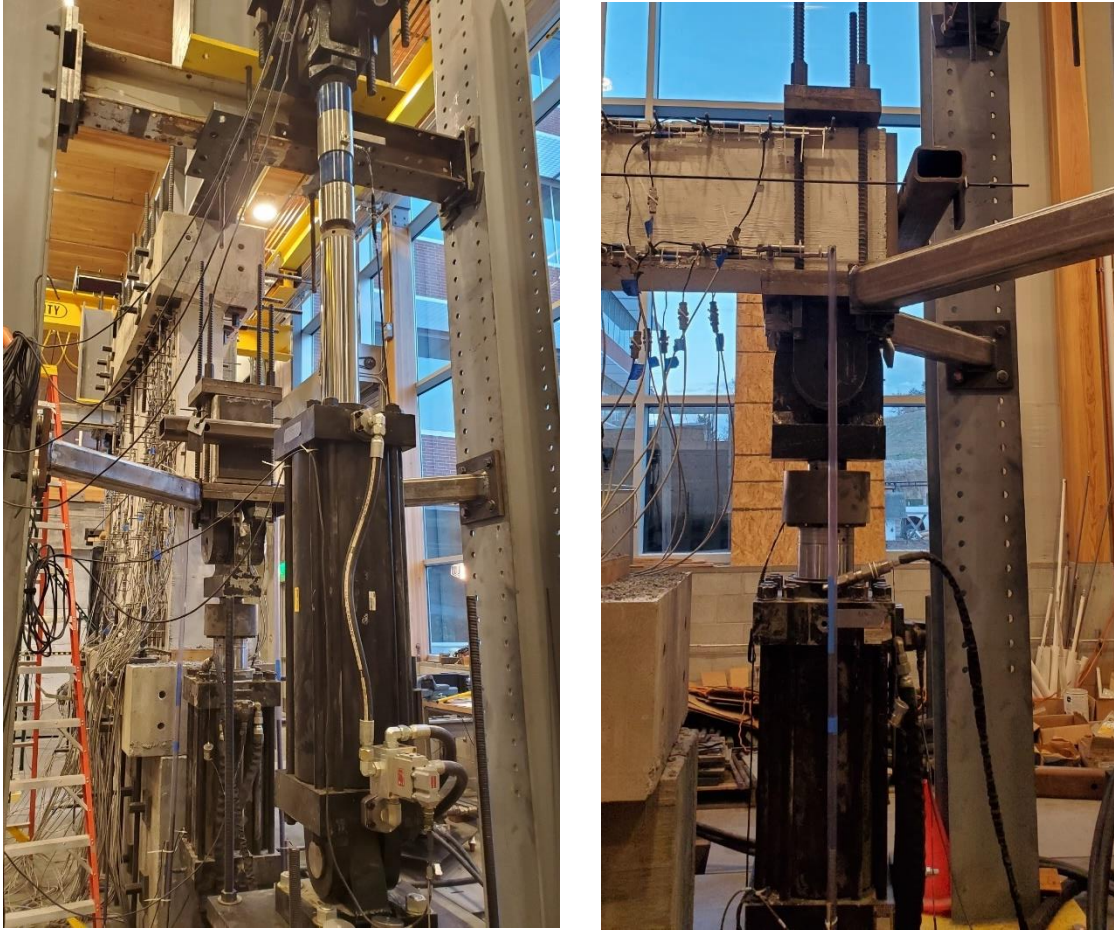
Photos of Out-of-Plane Test Beam Bracing
